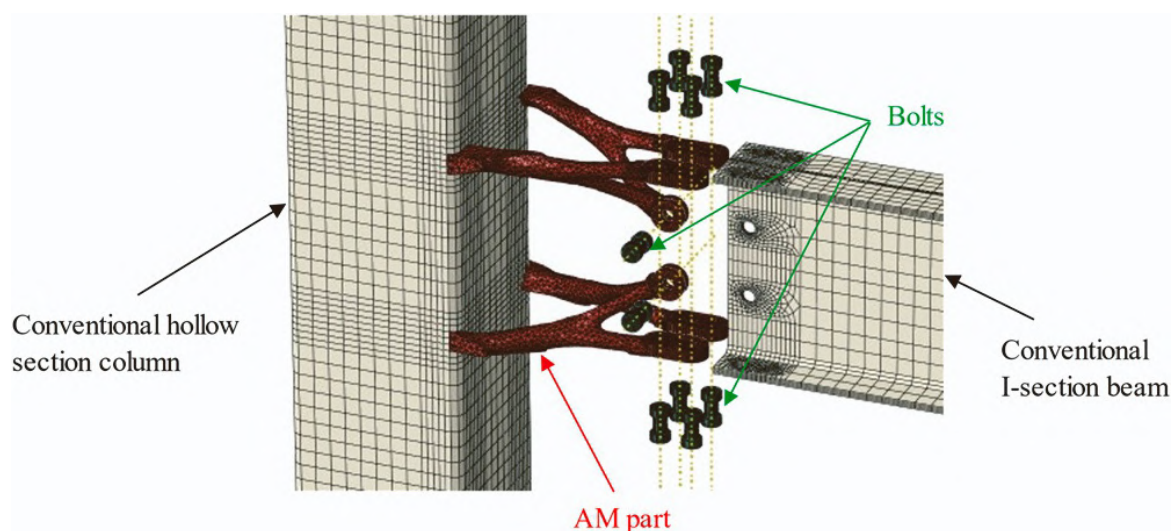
Optimized joint between an I-section beam and a hollow section column [4.1]
